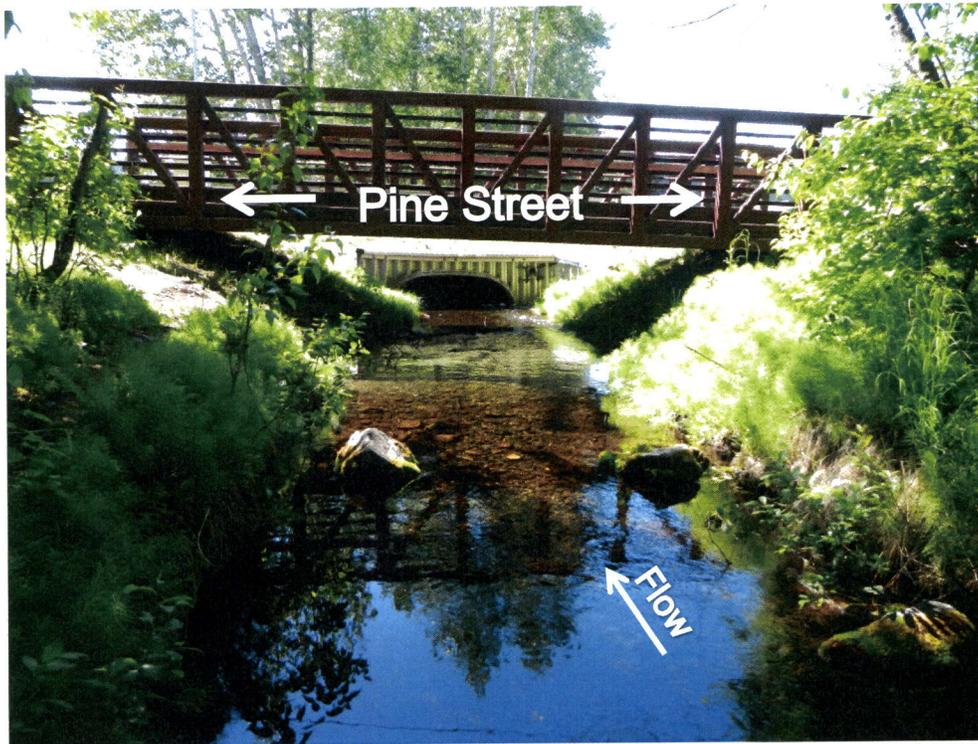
Middle Fork Chester Creek looking downstream at Pine Street culvert and pedestrian bridge. Photo was taken from location of Minnow Trap 4.
